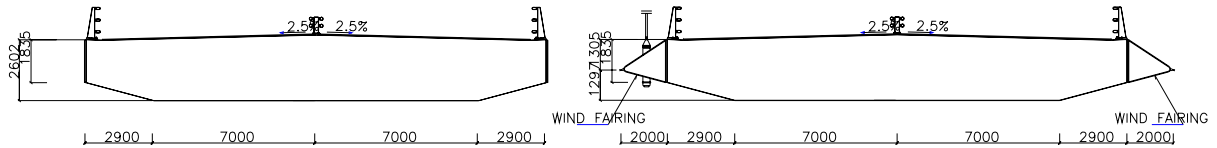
a) Bridge section without and b) with wind fairings. Dimensions in mm.
